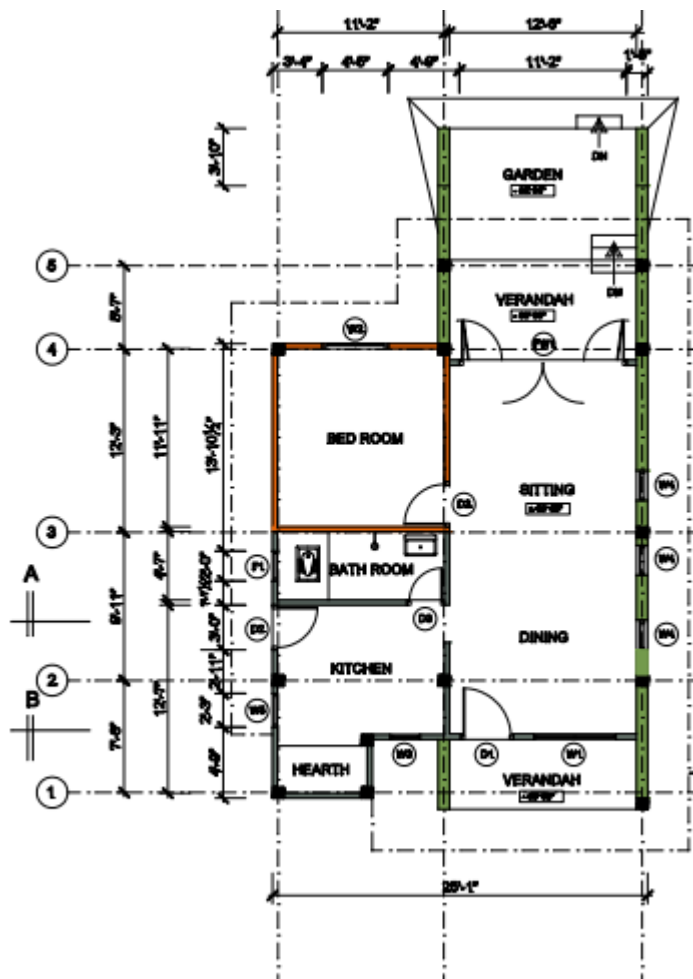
Real Scale Model at Yayawatta, Tangalle
